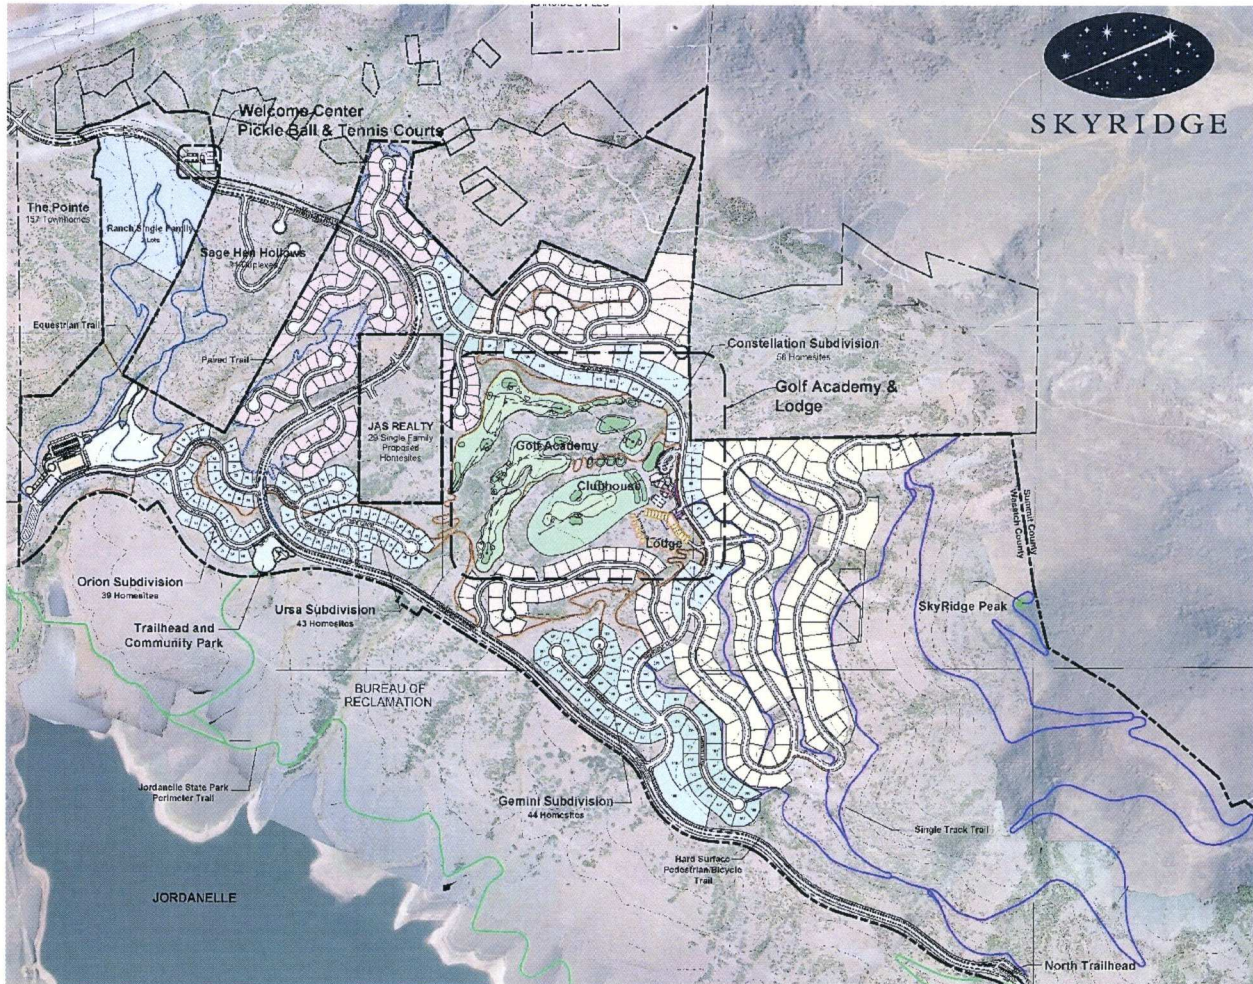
EXHIBIT M – GOLF ACADEMY LODGING FACILITY
